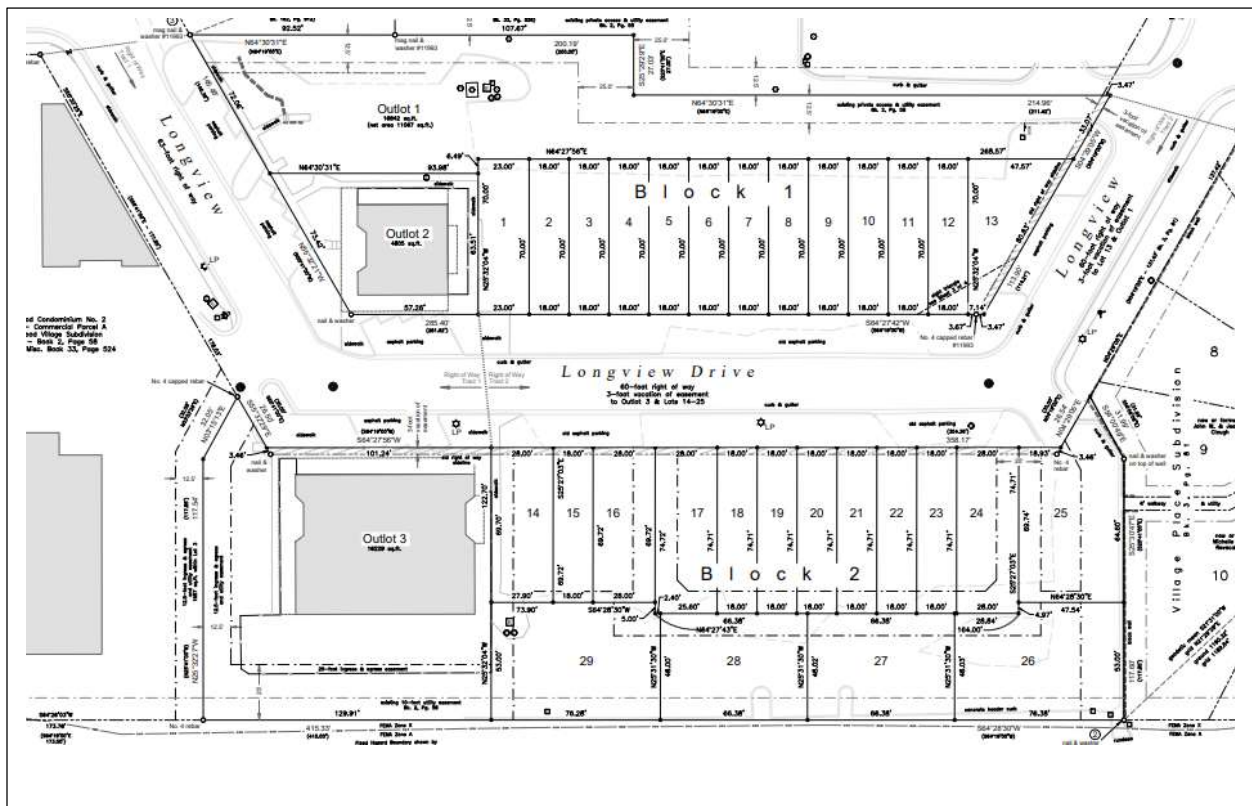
Excerpt of Subdivision Plat, Sheet 2
